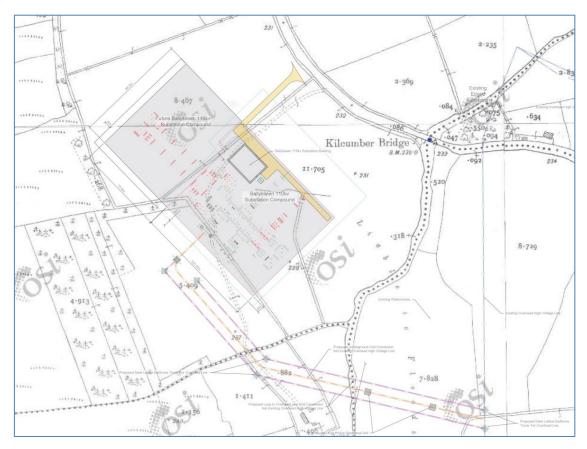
Proposed Kilcumber Bridge 110kV substation site overlain on 2nd Ed. OSi map.
